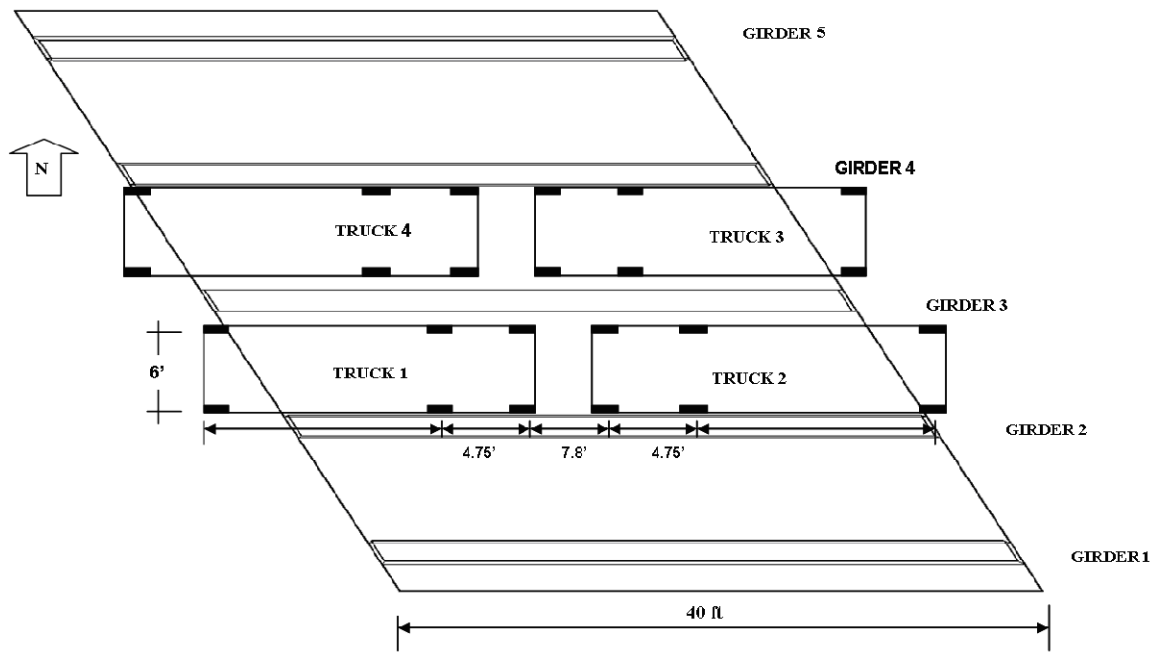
Placement of Trucks for Bartow County Bridge Load Test
